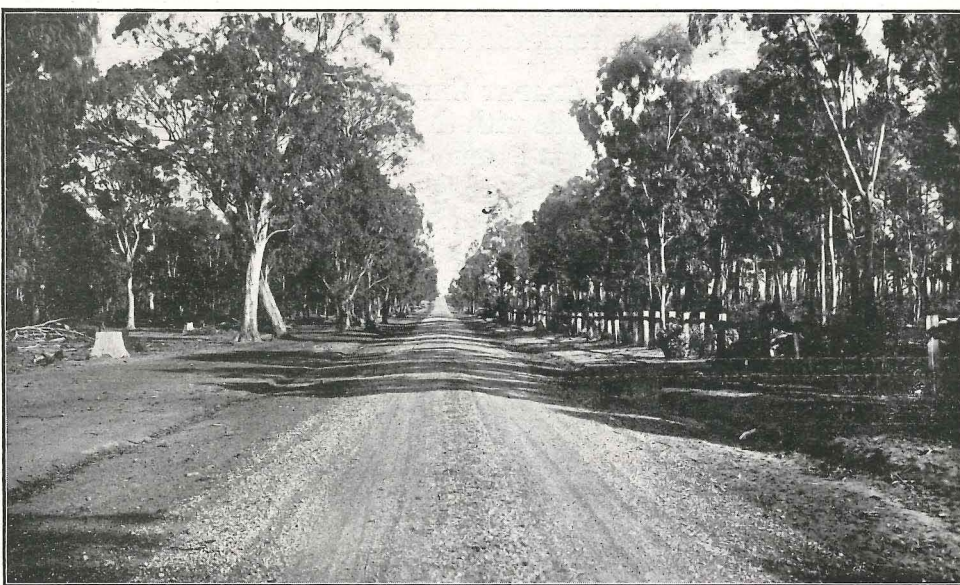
Completed gravelled section, Main Gippsland Road at Providence Ponds, Bairnsdale Shire.
